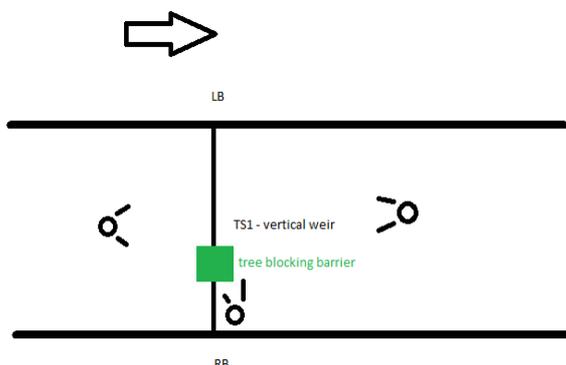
Site plan for Twickenham Barrier 3
